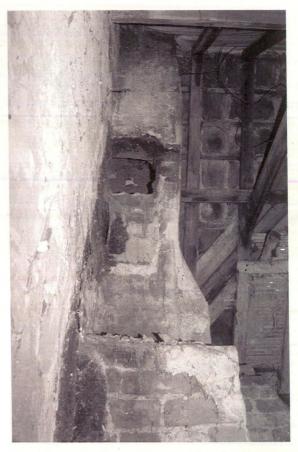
South side of chimney of hearth, showing opening into chimney, looking north
